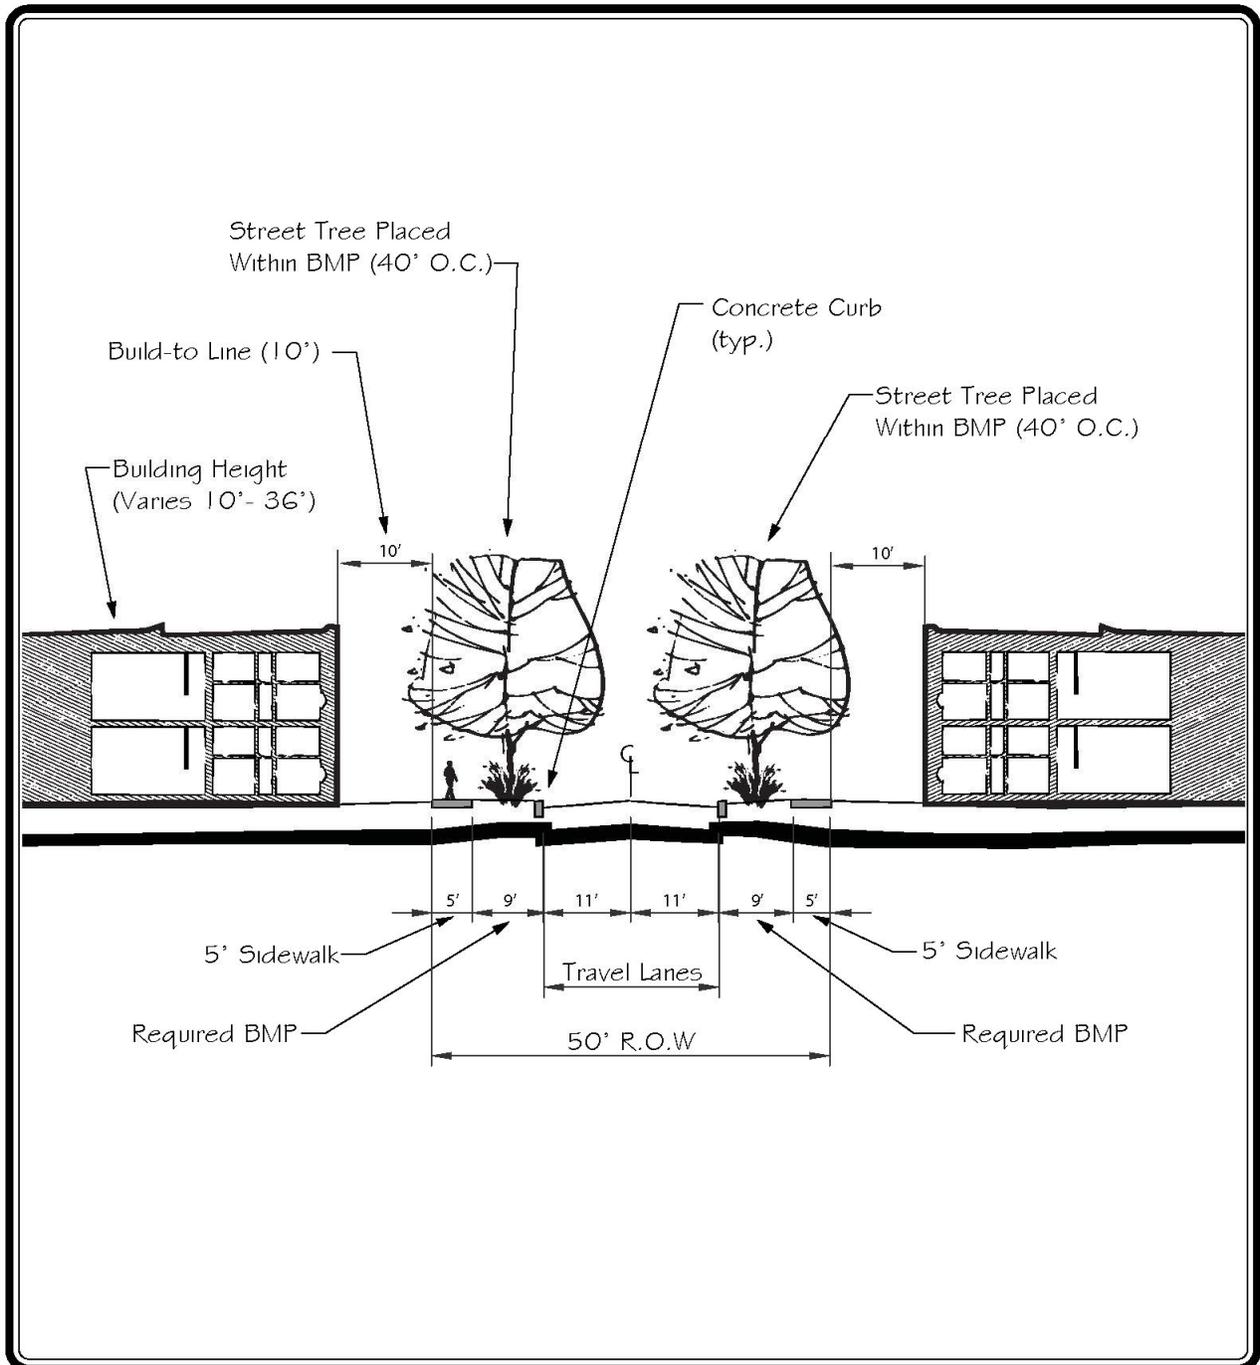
SECTION 314.05 -07 TYPICAL LOCAL ROAD DETAILS WITH NO PARALLEL PARKING
